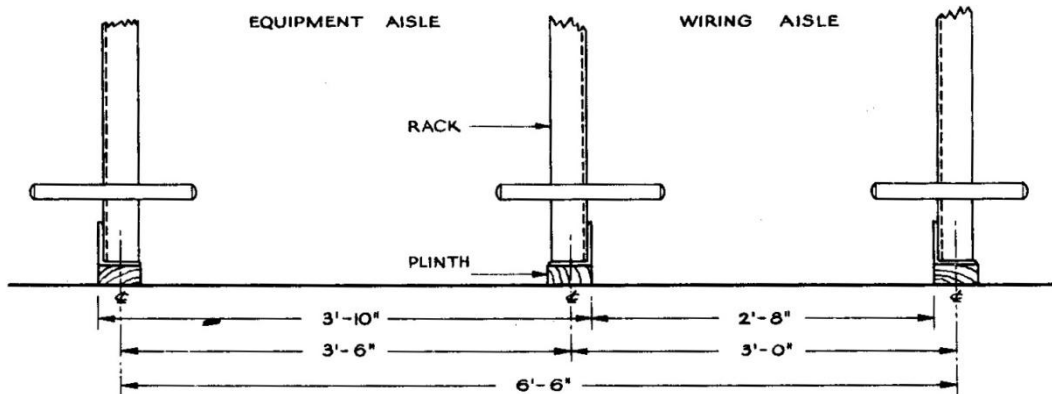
STANDRAD AISLE DIMENSIONS 2000 TYPE EQUIPMENT.
